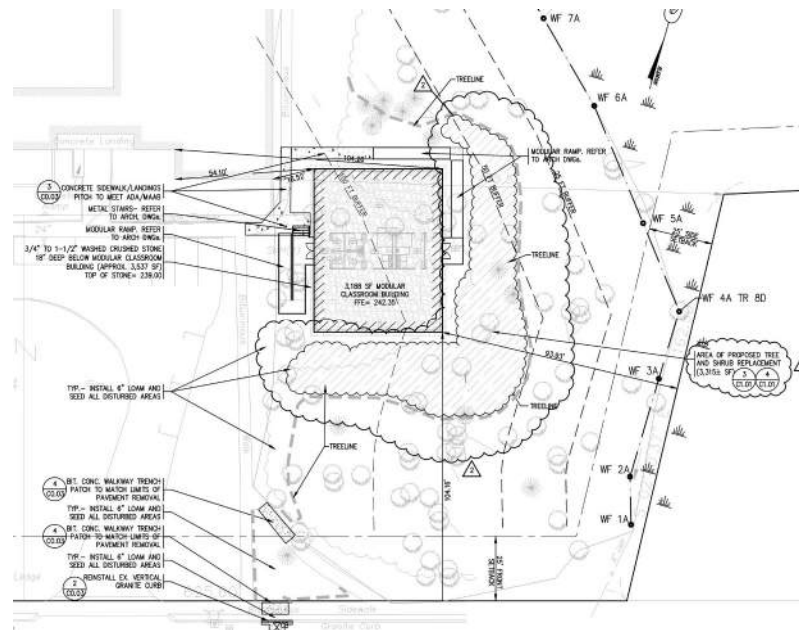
09/13/2018 Site Layout Plan for Second Group of Modular Classrooms (east side of existing building) (full plan is available in appendix)
